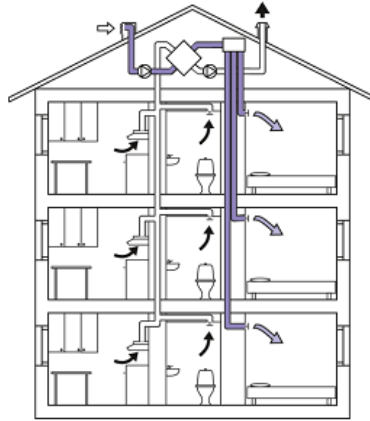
Centralized mechanical ventilation in an apartment building [1]
